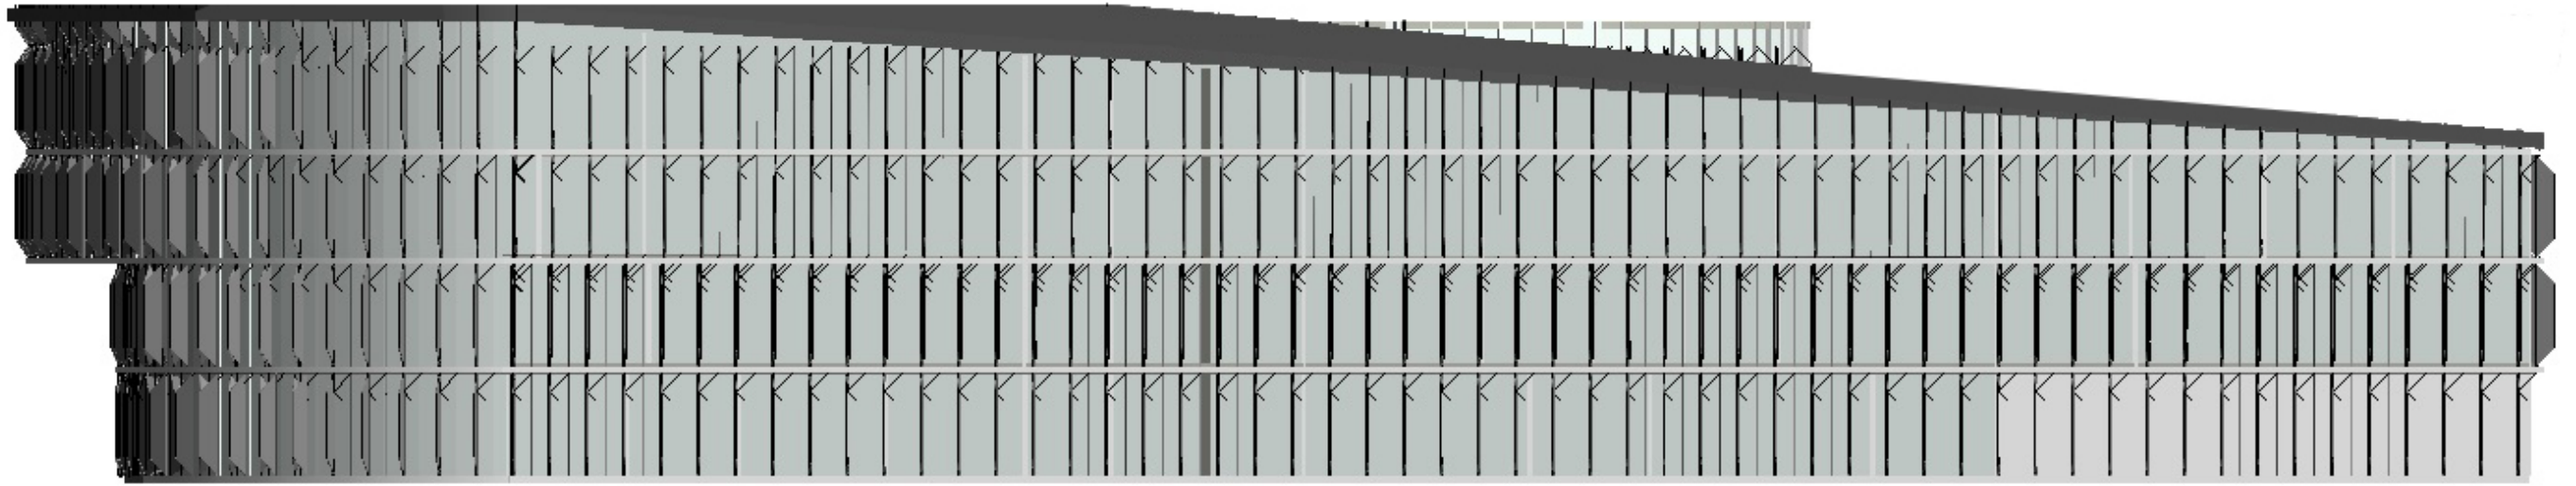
Elevation C with optimal kinetic facade pattern at 9 am.
